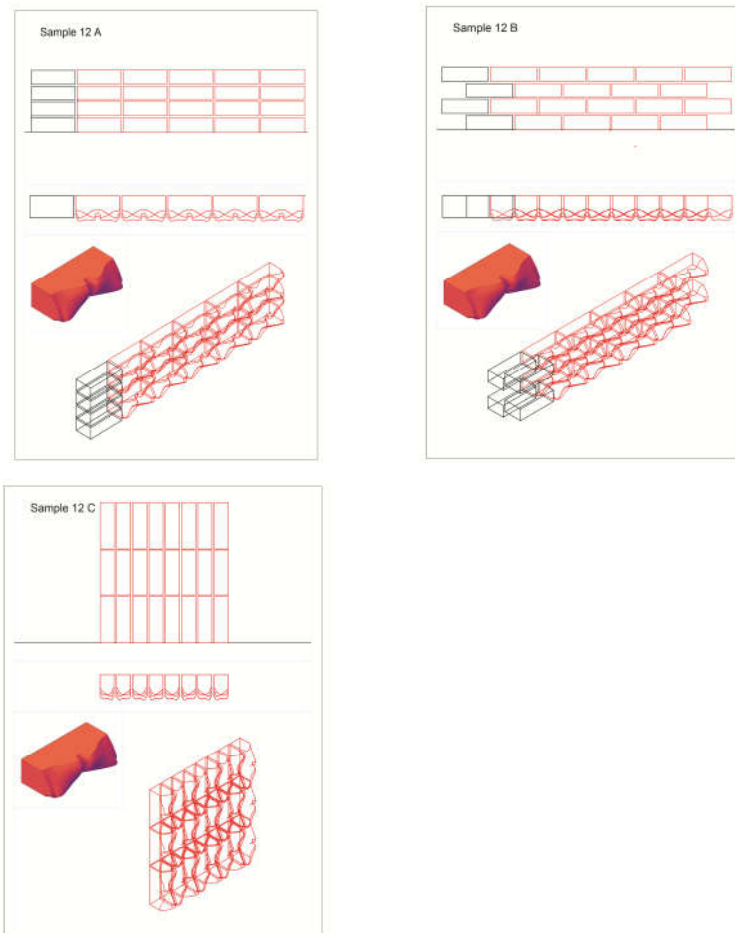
Drawings showing assemblies of bespoke bricks (Model 12) within a standard brick wall. Bespoke bricks are shown in red, standard bricks are shown in black
